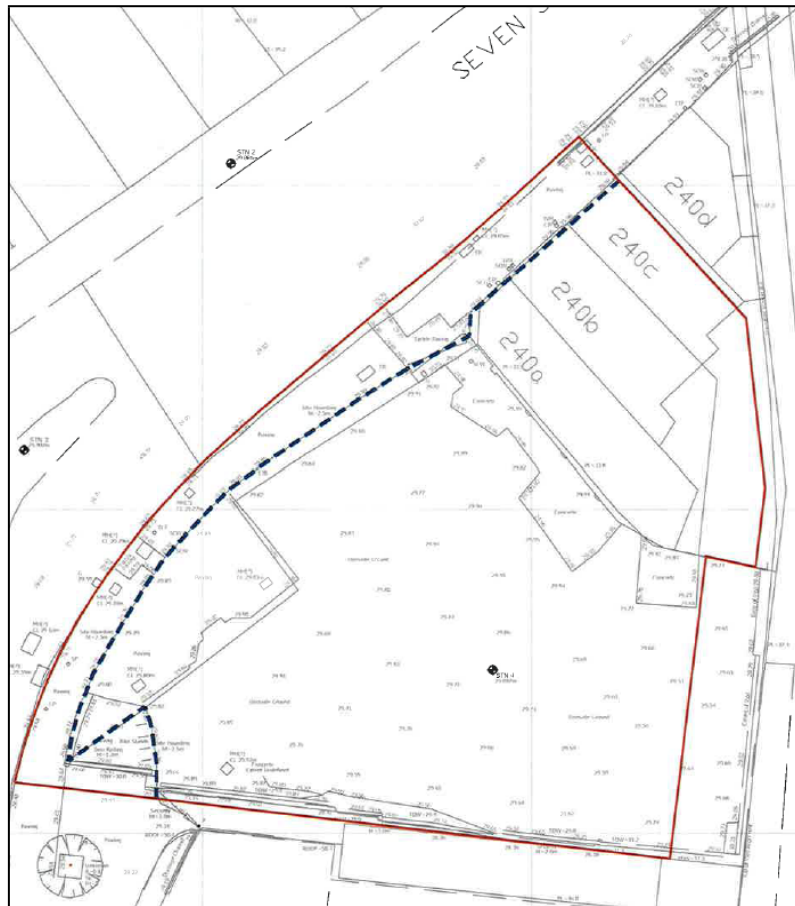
Extract from Plan No. VD18851-SK008; showing existing site boundary (red) and highway boundary (in navy)
